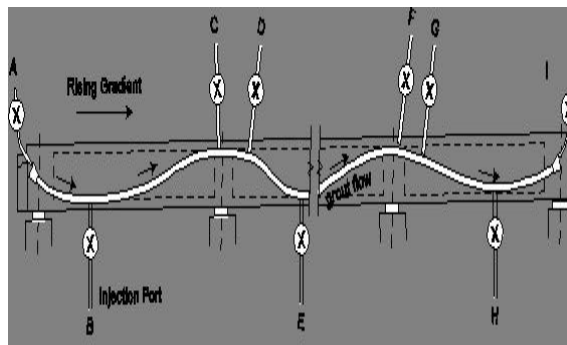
Grouting details for cellular box, voided or solid slab duct system
